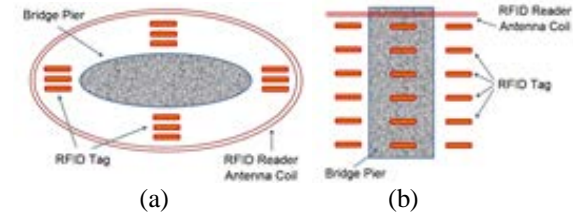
(a) Cross sectional top view of the bridge pier and RFID tag arrangement (b) Cross sectional side view of the bridge pier and RFID tag arrangement
